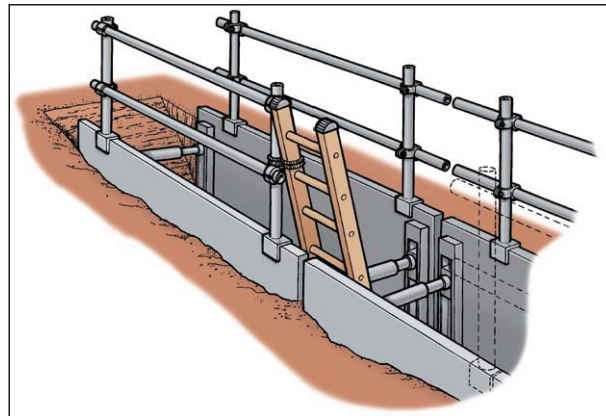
Trench boxes put in place without workers needing to enter the excavation.
